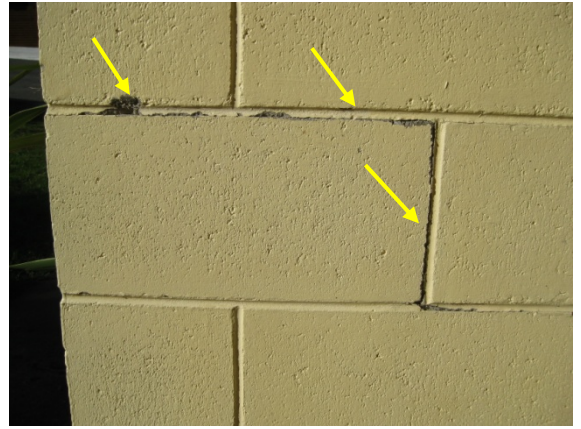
Close up of Photo 8 (Eastern Front Wall - 2)
